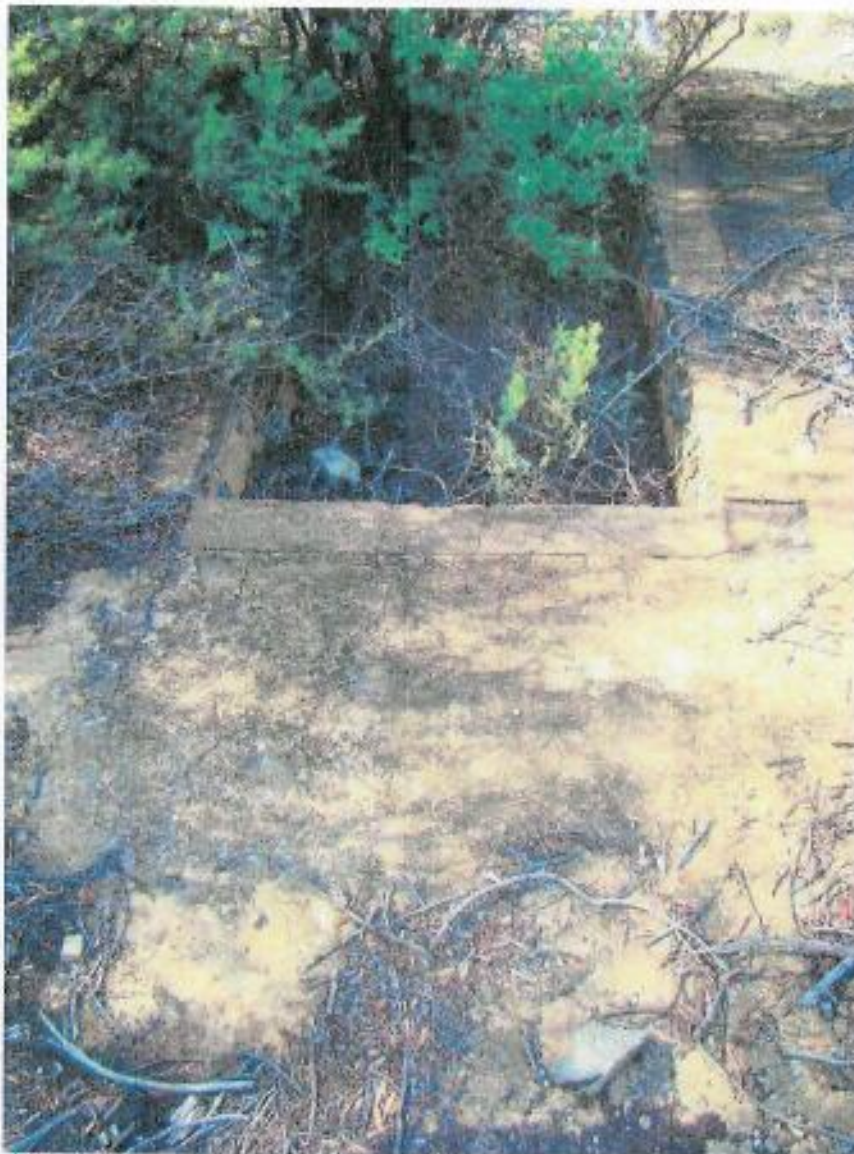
This structure is at the base of the machine dump and seems to have been the foundation for some machinery (Note rectangular ditch in foundation)
